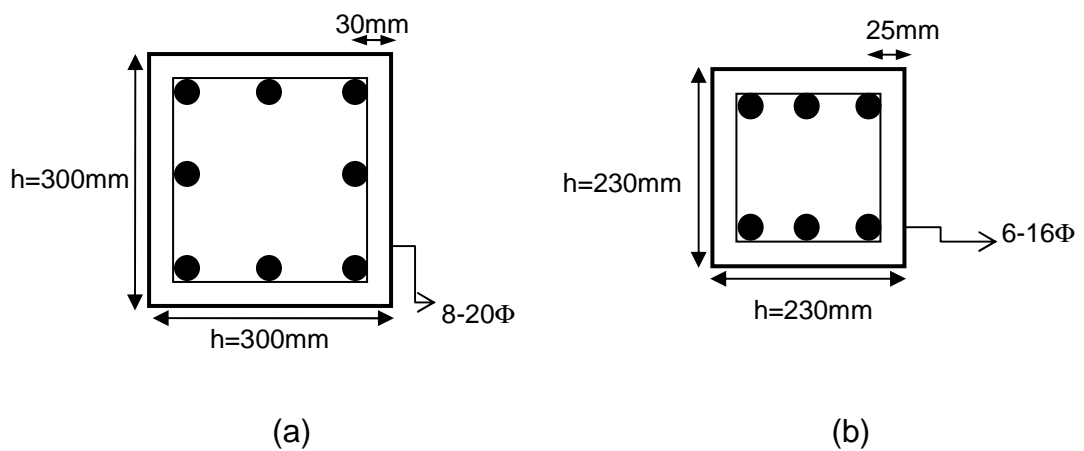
(a) Column and (b) beam cross-section with reinforcing steel details
